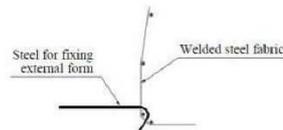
Example of the method to arrange steel for fixing external form to welded steel fabric
